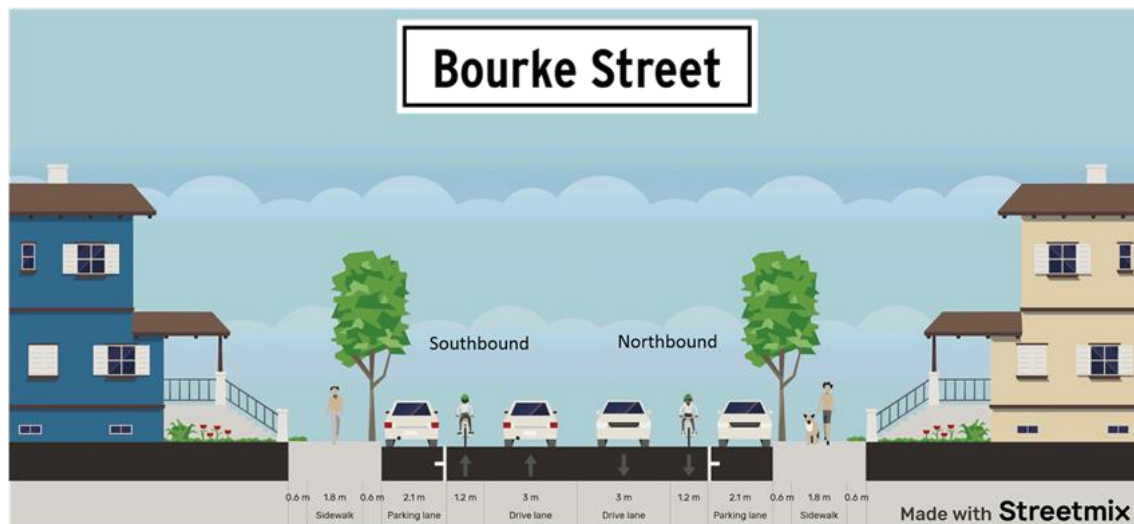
Cross Section of Existing Bourke Street (40 Bourke Street)
